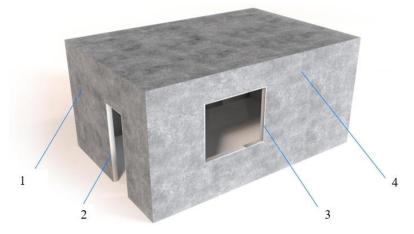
Structural solution of fibroshotcrete concrete volumetric block:
